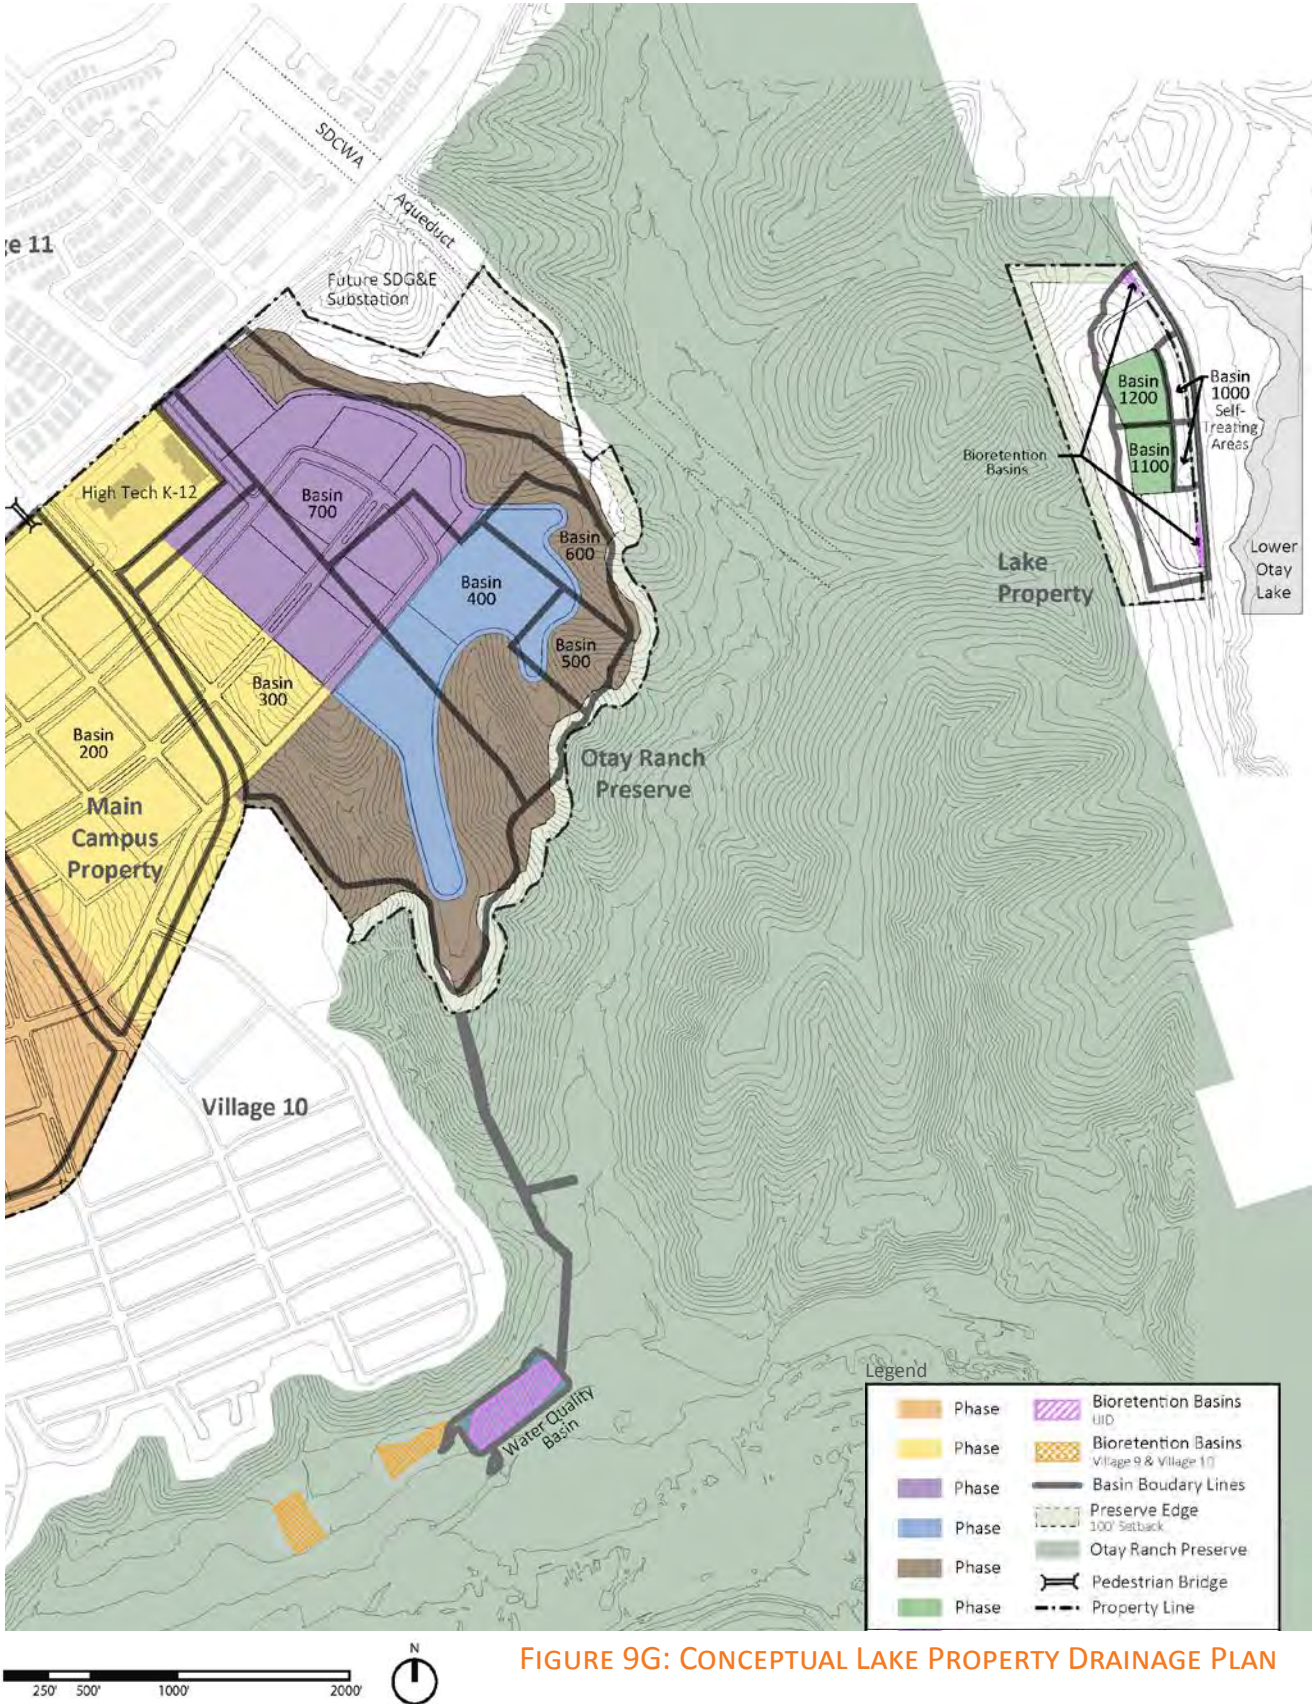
G: CONCEPTUAL LAKE PROPERTY DRAINAGE PLAN
